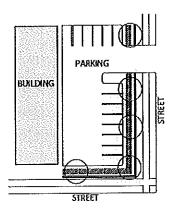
Landscaping Buffer with Evergreen Plantings—Plan View
